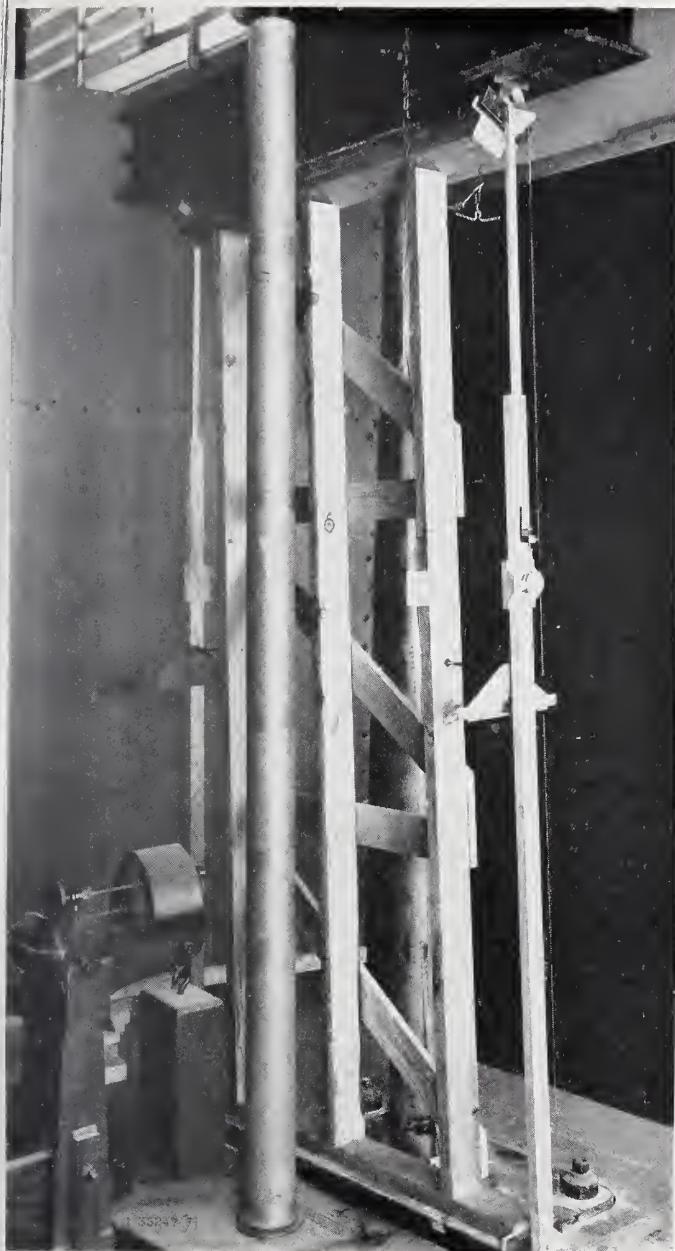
Failure of wall frame QAf-C3 under compressive load.
